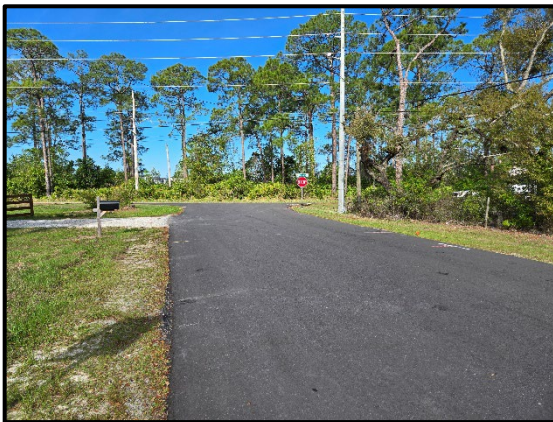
General conditions of Arrowhead Boulevard looking west toward Avalon Road.
